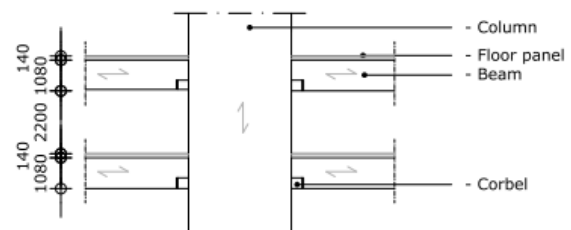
Column-to-beam connection corbel with hanging beam in mm
